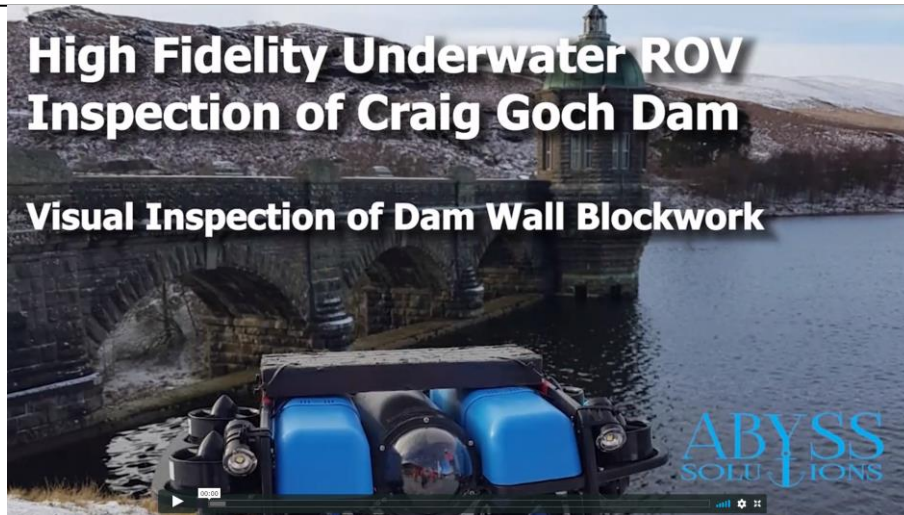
Inspection video of dam wall blockwork ([click here](#) or on the image above to launch).
